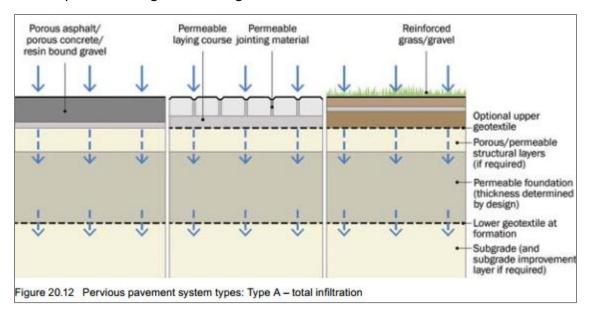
Typical Cross Section of infiltration permeable paving (Extract from CIRA SuDs Manual)
